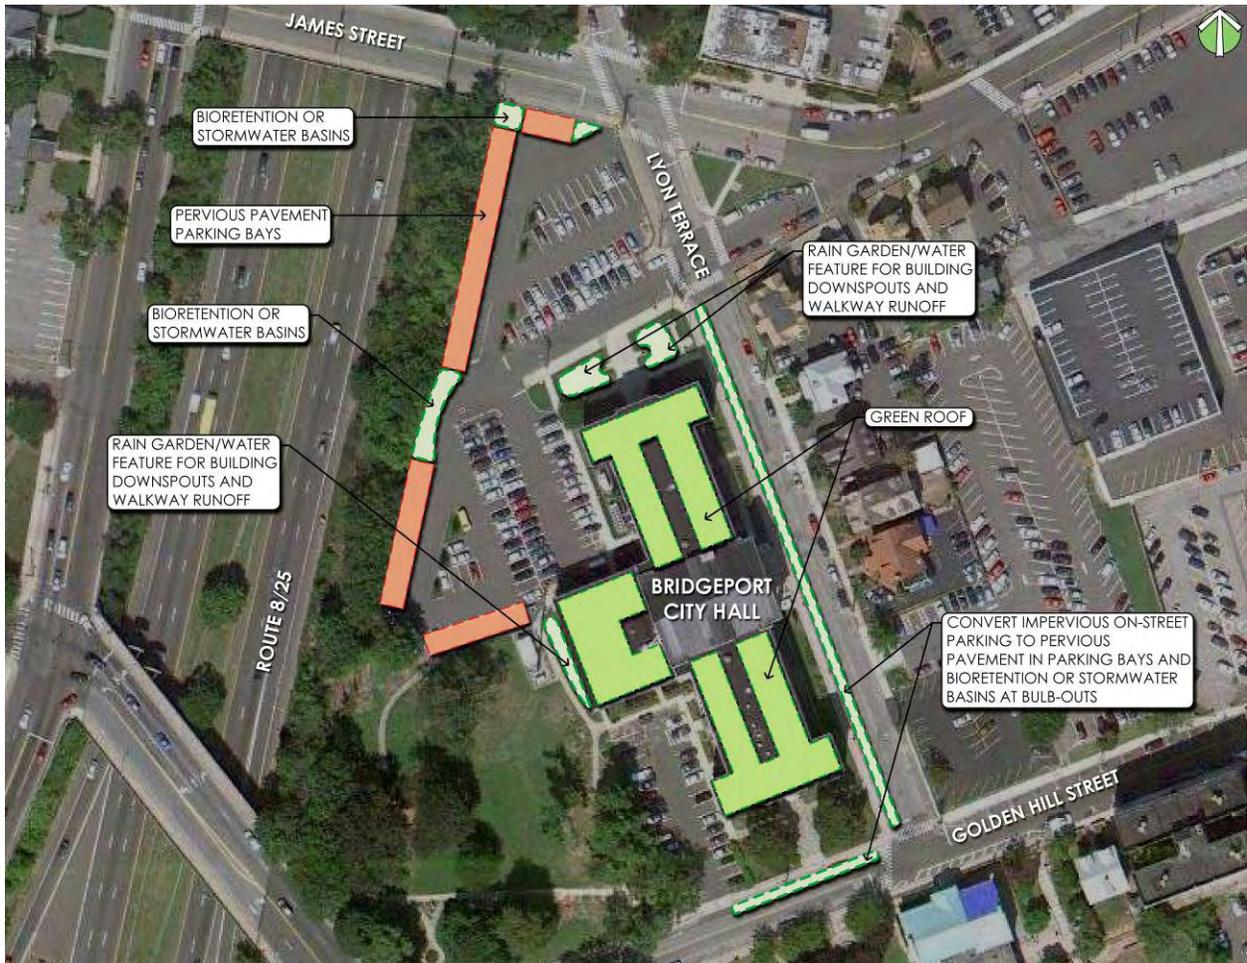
Bridgeport City Hall LID Retrofit Concept
